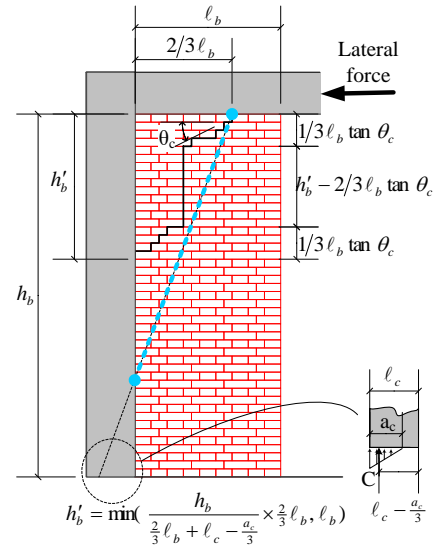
The idealised major fracture path of an RC column with a brick wall pier.
